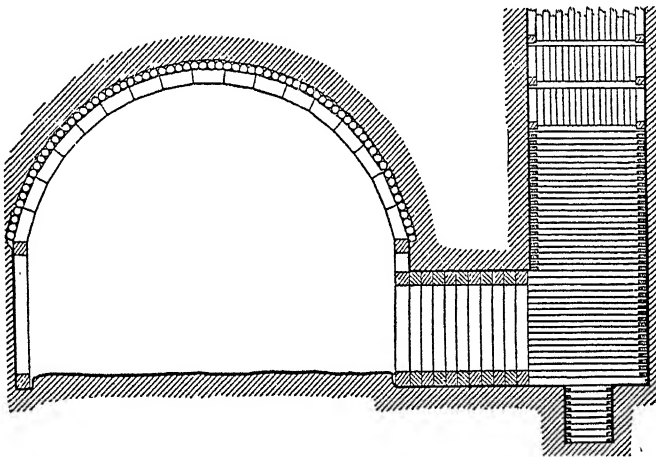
Connection with Shaft, Church Hill Tunnel.
